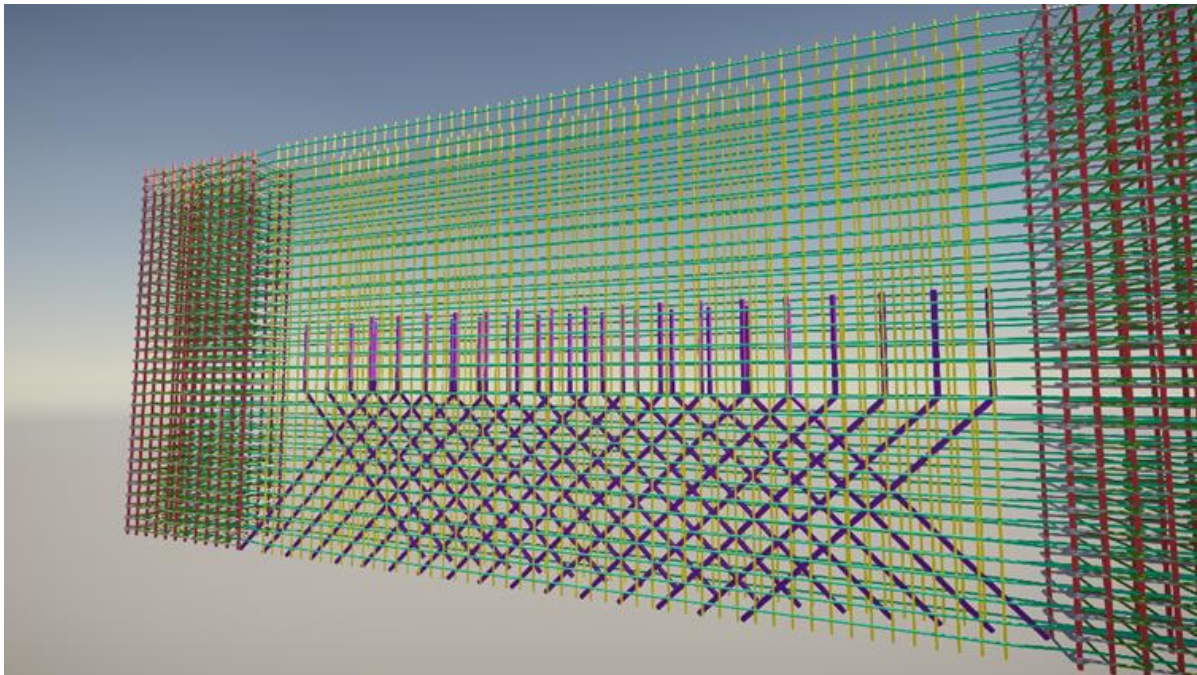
Bidirectional X shaped reinforcement for sliding shear (DCH design)
